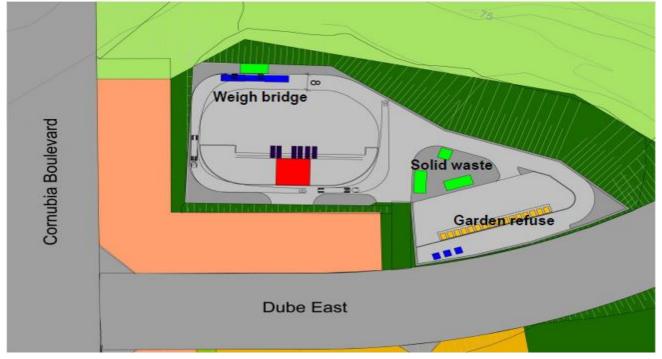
PROPOSED LAYOUT OF THE NEW MOUNT EDGECOMBE REFUSE TRANSFER STATION AT THE PREFERRED SITE
